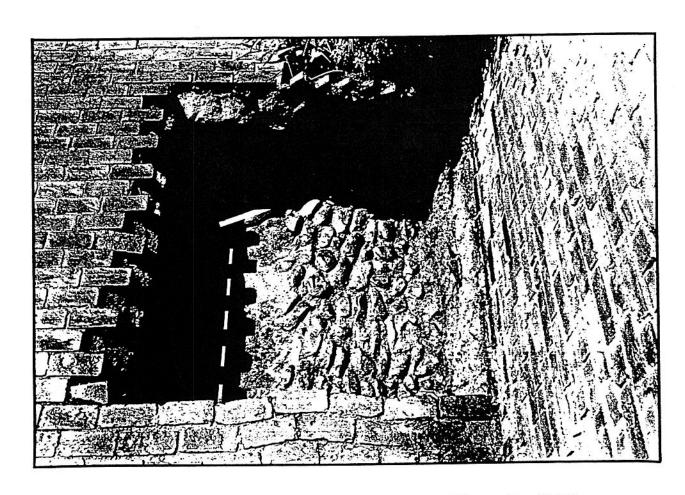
Excavation Unit C: Photograph of cobble paving (C11). West at top.
